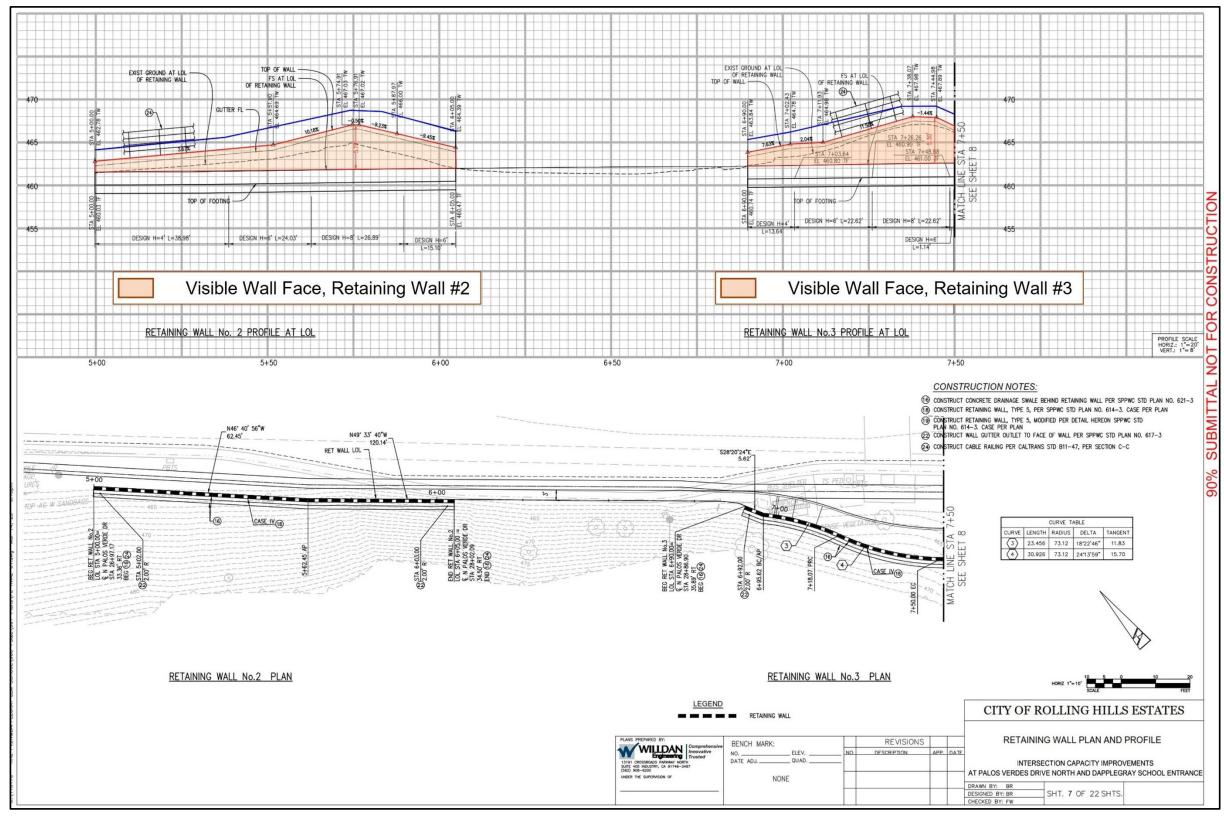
Retaining Walls No. 2, 3 (Schematic Illustration)
